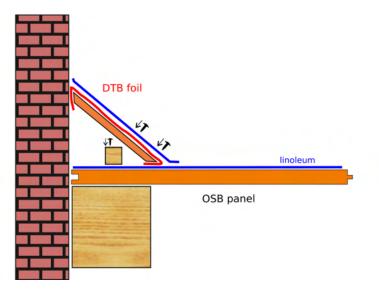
Diagram of the construction of the protection of walls and chimneys in section. Warning: The screws must always be covered with DTB foil or linoleum!
